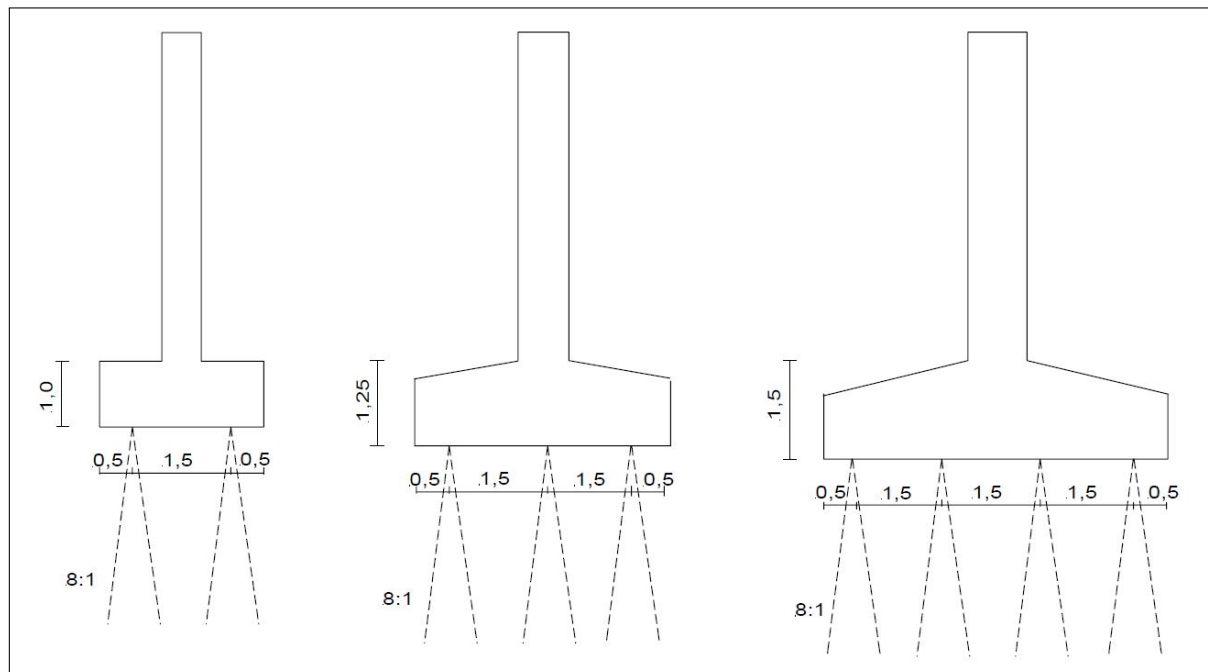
Design guidelines for the intermediate supporting piers[18]
